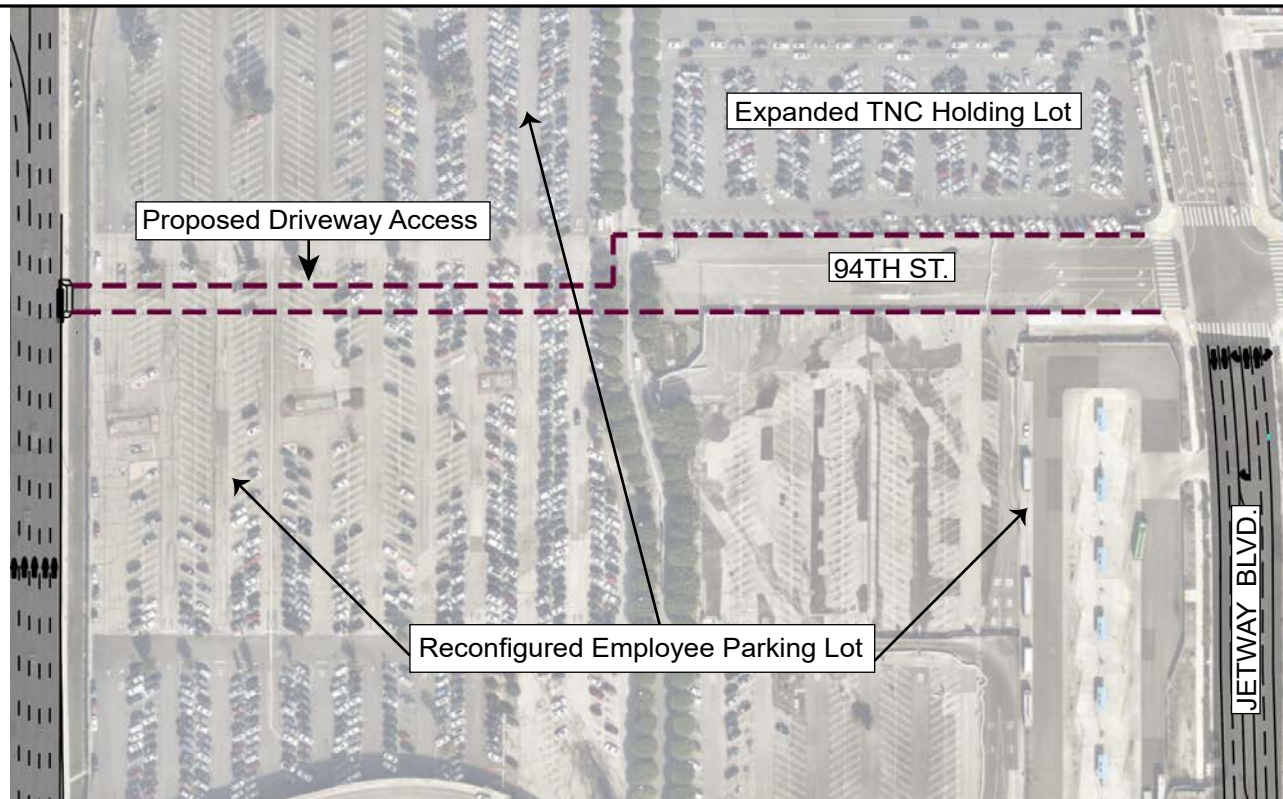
A new driveway access would be provided from northbound Sepulveda Boulevard to the east in line with 94th Street. The existing parking lot/vehicle staging areas would be reconfigured as follows: the areas south of 94th Street and in the northwestern quadrant would be used for employee parking; the northeastern quadrant would house the expanded TNC Holding Lot and, to the north of that, the relocated LAX Taxi Staging Lot (not shown). The existing airport shuttle/limousine staging area would be relocated to the northeast corner of Airport Boulevard and 96th Street (not shown).
